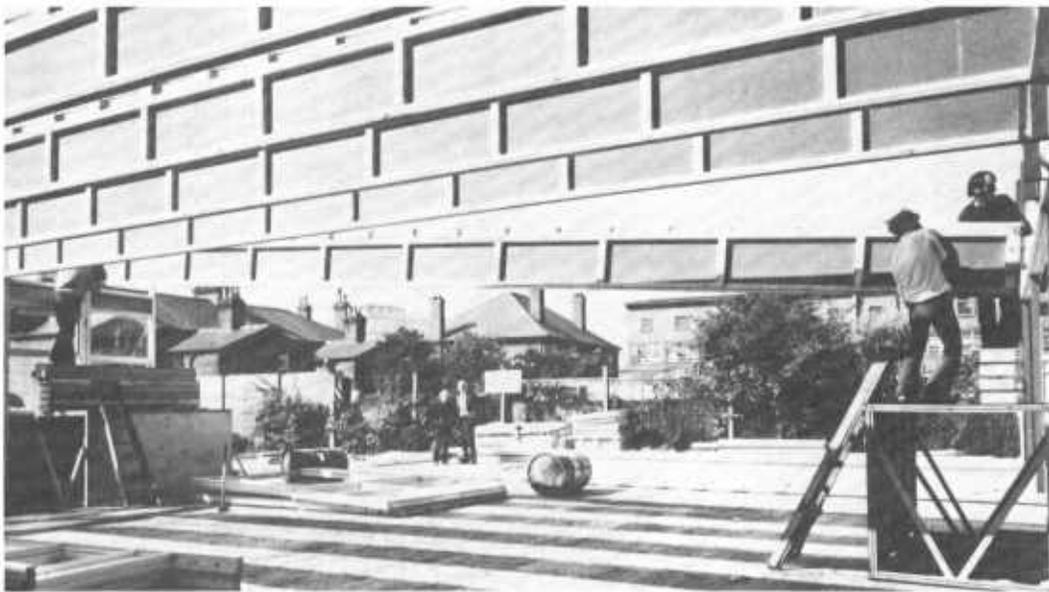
Twelve-meter-span hardboard I-beams for roof of post office mail-sorting office at Southall, London (McNatt 1980).
